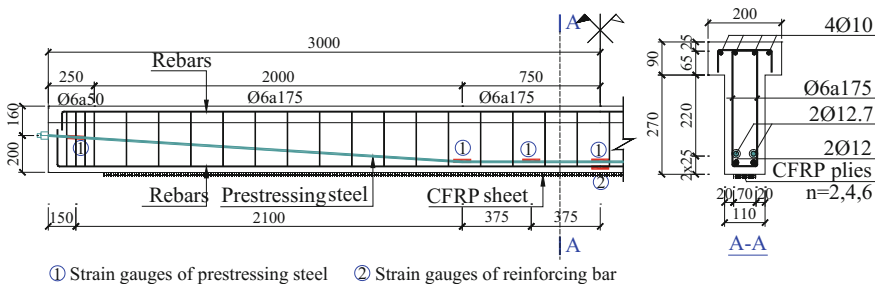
Details of internal reinforcement with the arrangement of strain gauges (dimensions in mm)
